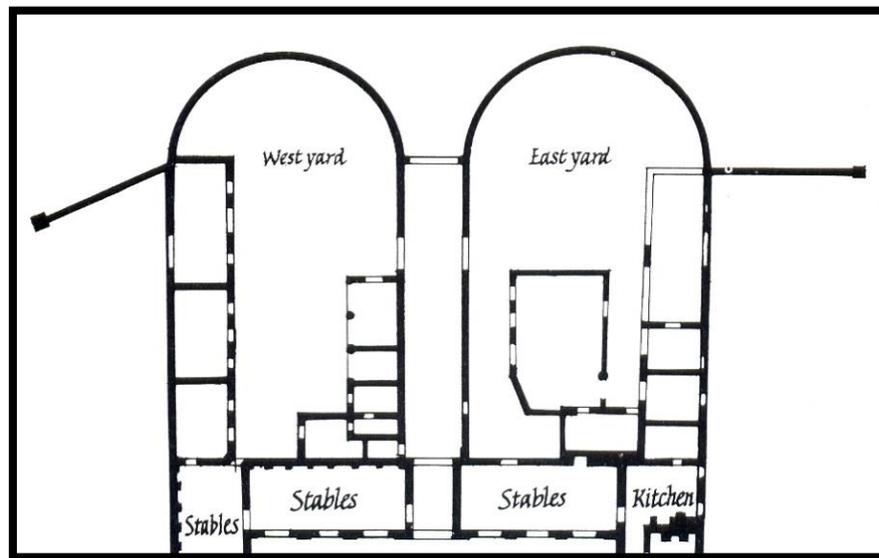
Plan of East and West Yards at Bishop's Palace, Downhill, *National Trust
